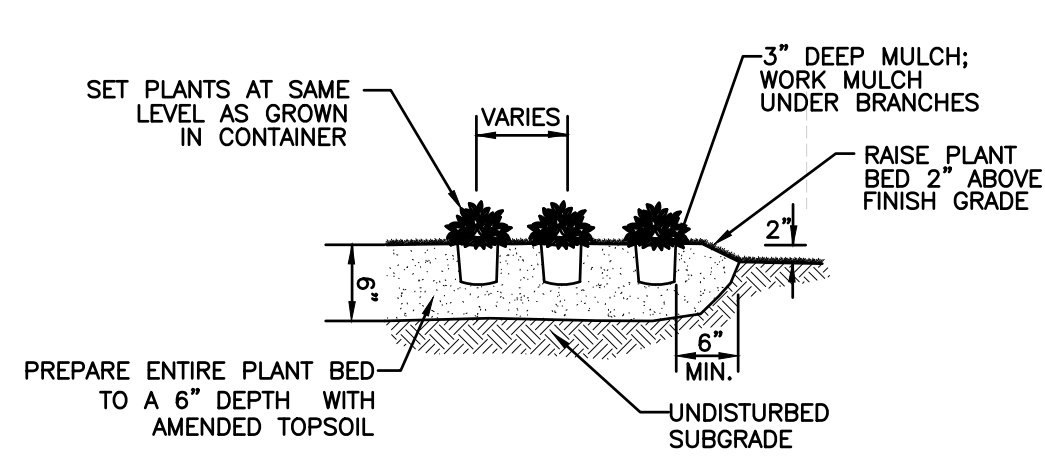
SHRUB/ SMALL TREE PLANTING DETAIL
